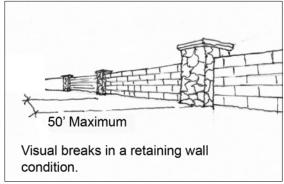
Visual breaks in fencing and retaining walls can be provided by pillars or other architectural treatments.
